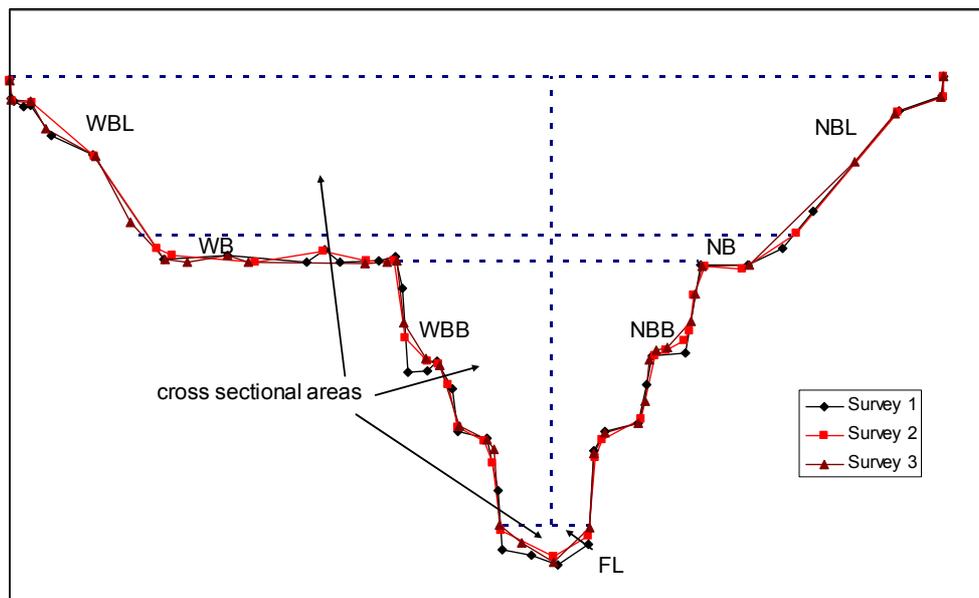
Profile of step batter drain showing cross sectional areas of drain components
